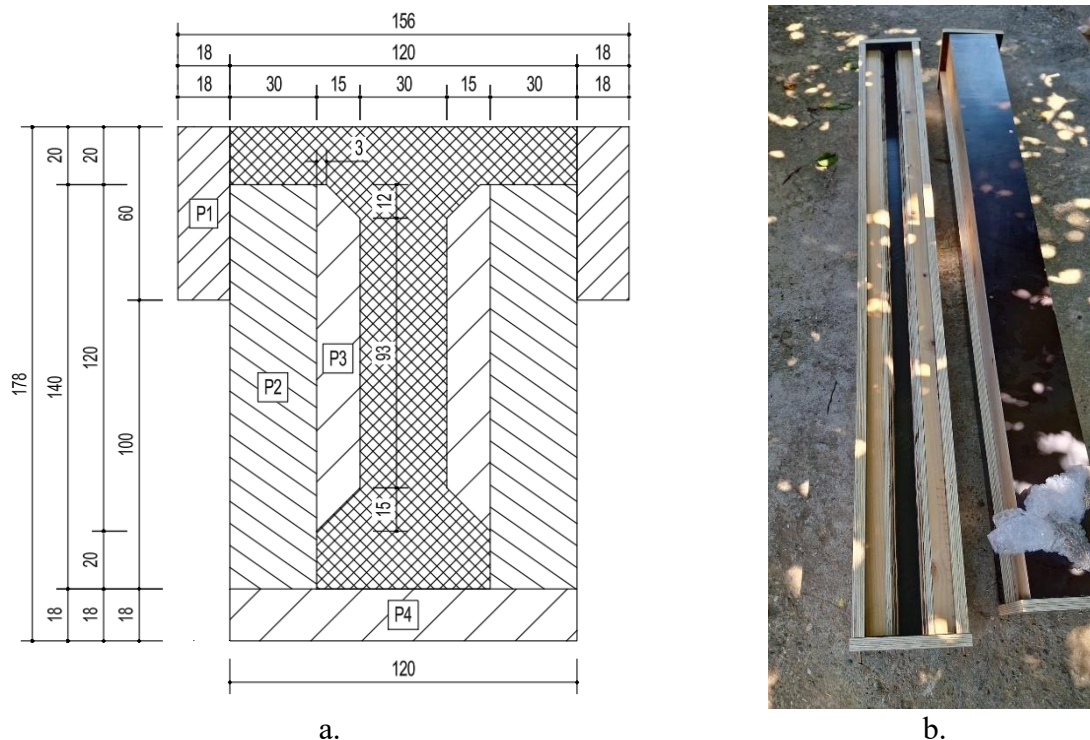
Model beam: a. Formwork Layout; b. Formwork Assembly
